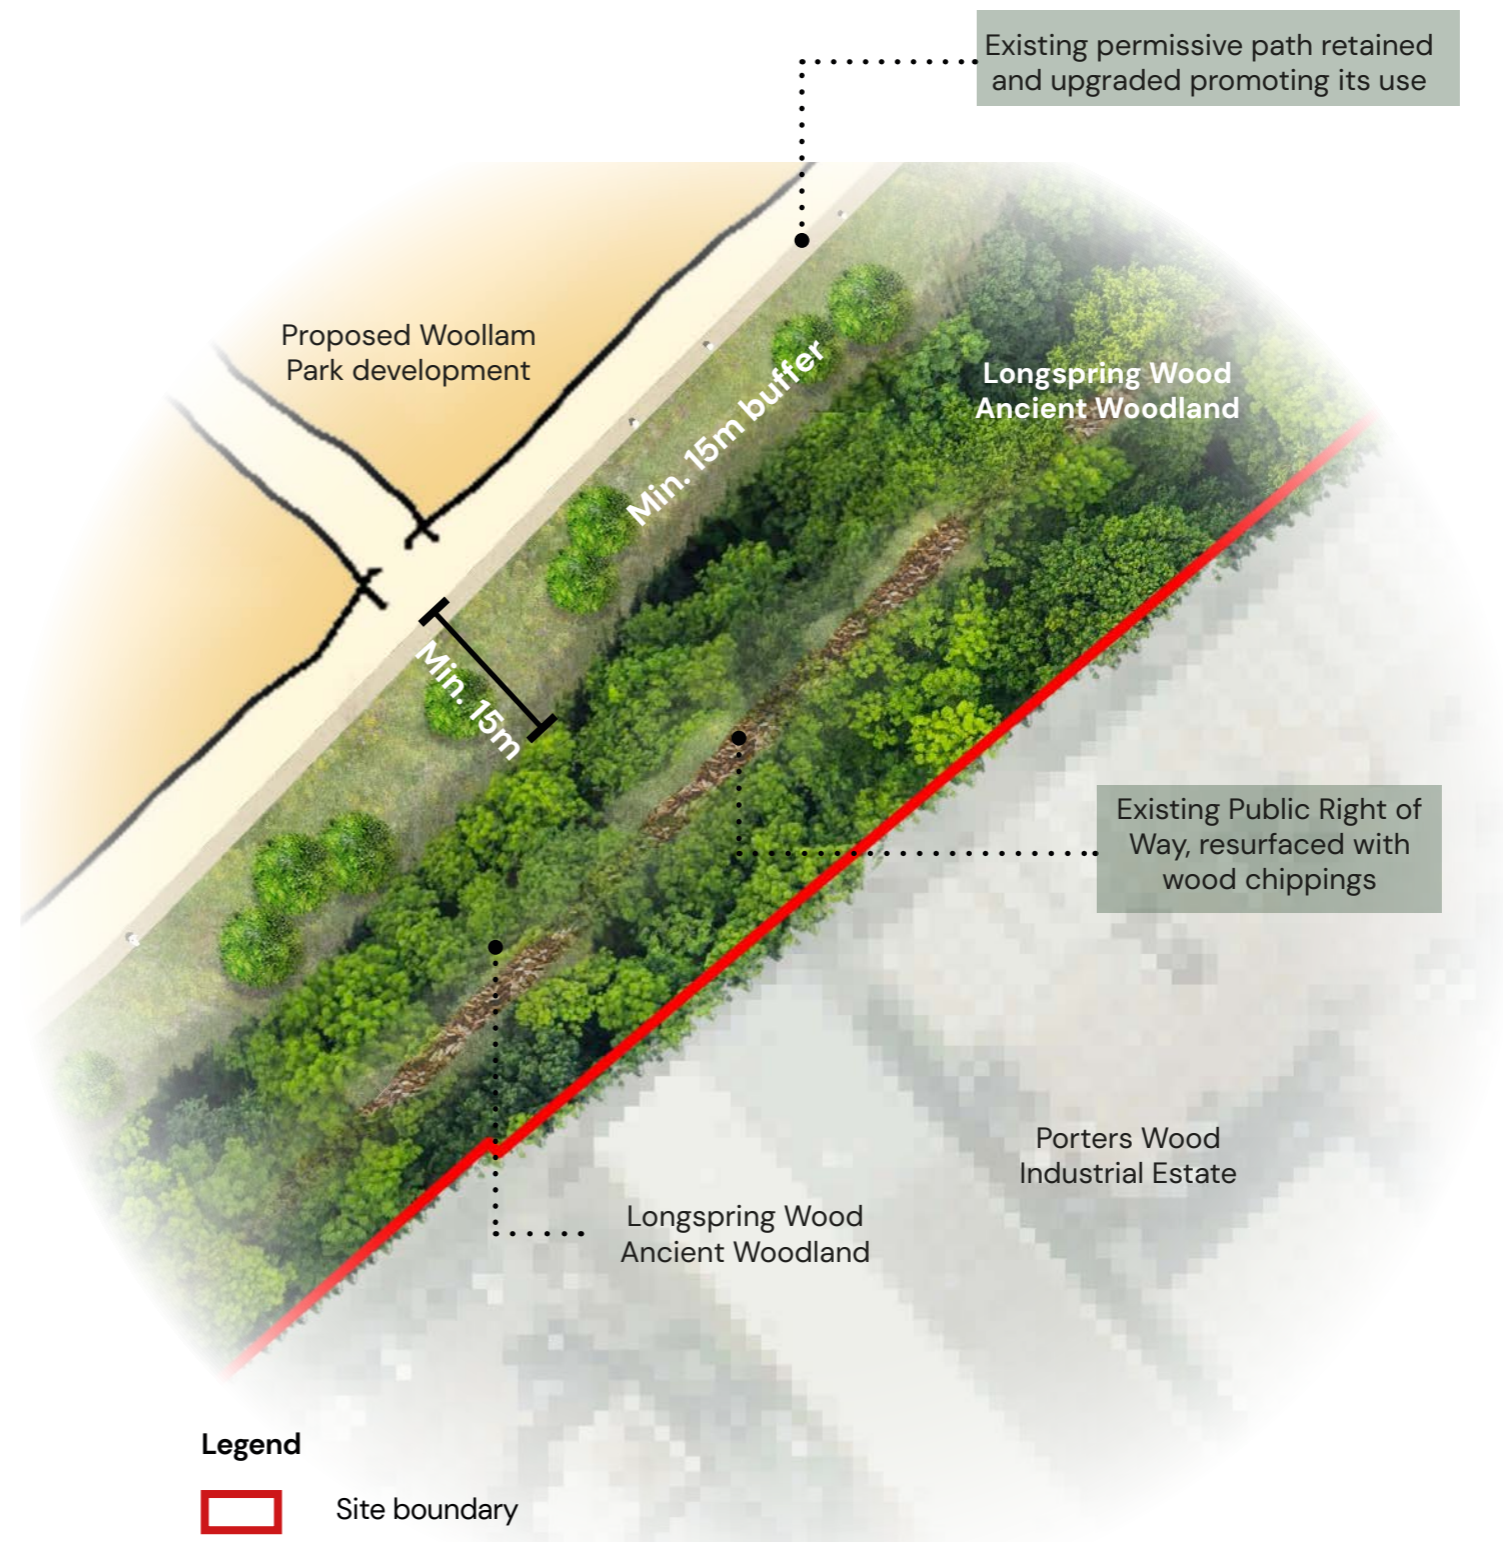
PROPOSAL FOR LONGSPRING WOOD PUBLIC RIGHT OF WAY
